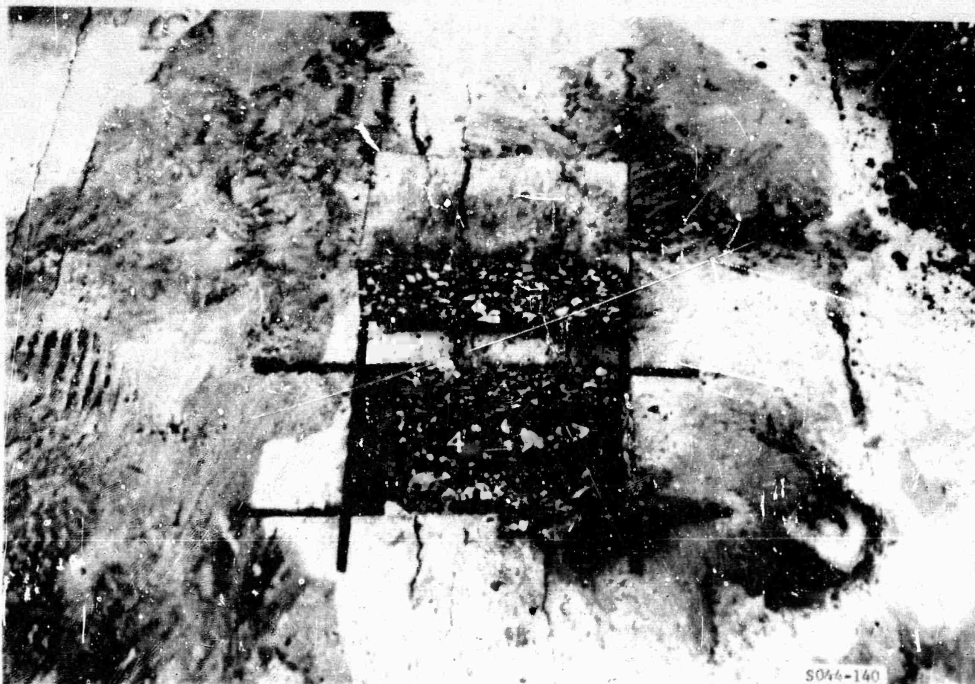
Slab Removed from Flexible Pavement, Item 4, Lane 1, After Failure, Showing Extent of Fatigue Cracking
